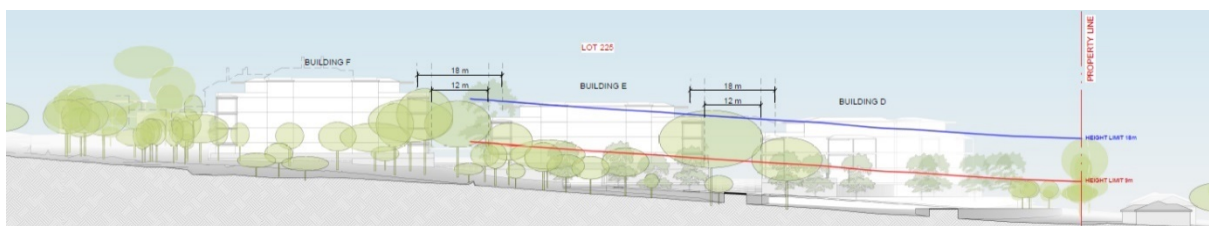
View facing South, from behind dwellings on Rose Street. (Marchese Partners | Life^{3A}, 2024)
